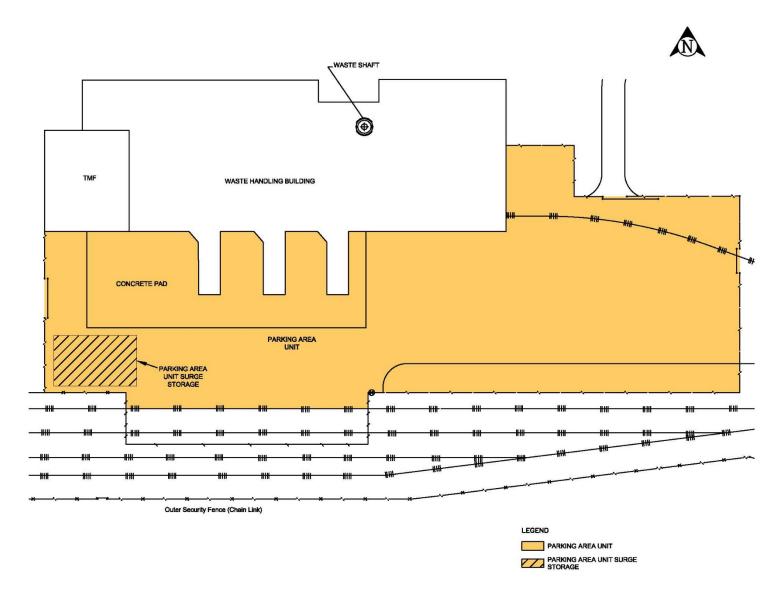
Parking Area Unit – TRU Mixed Waste Container Storage and Surge Areas
